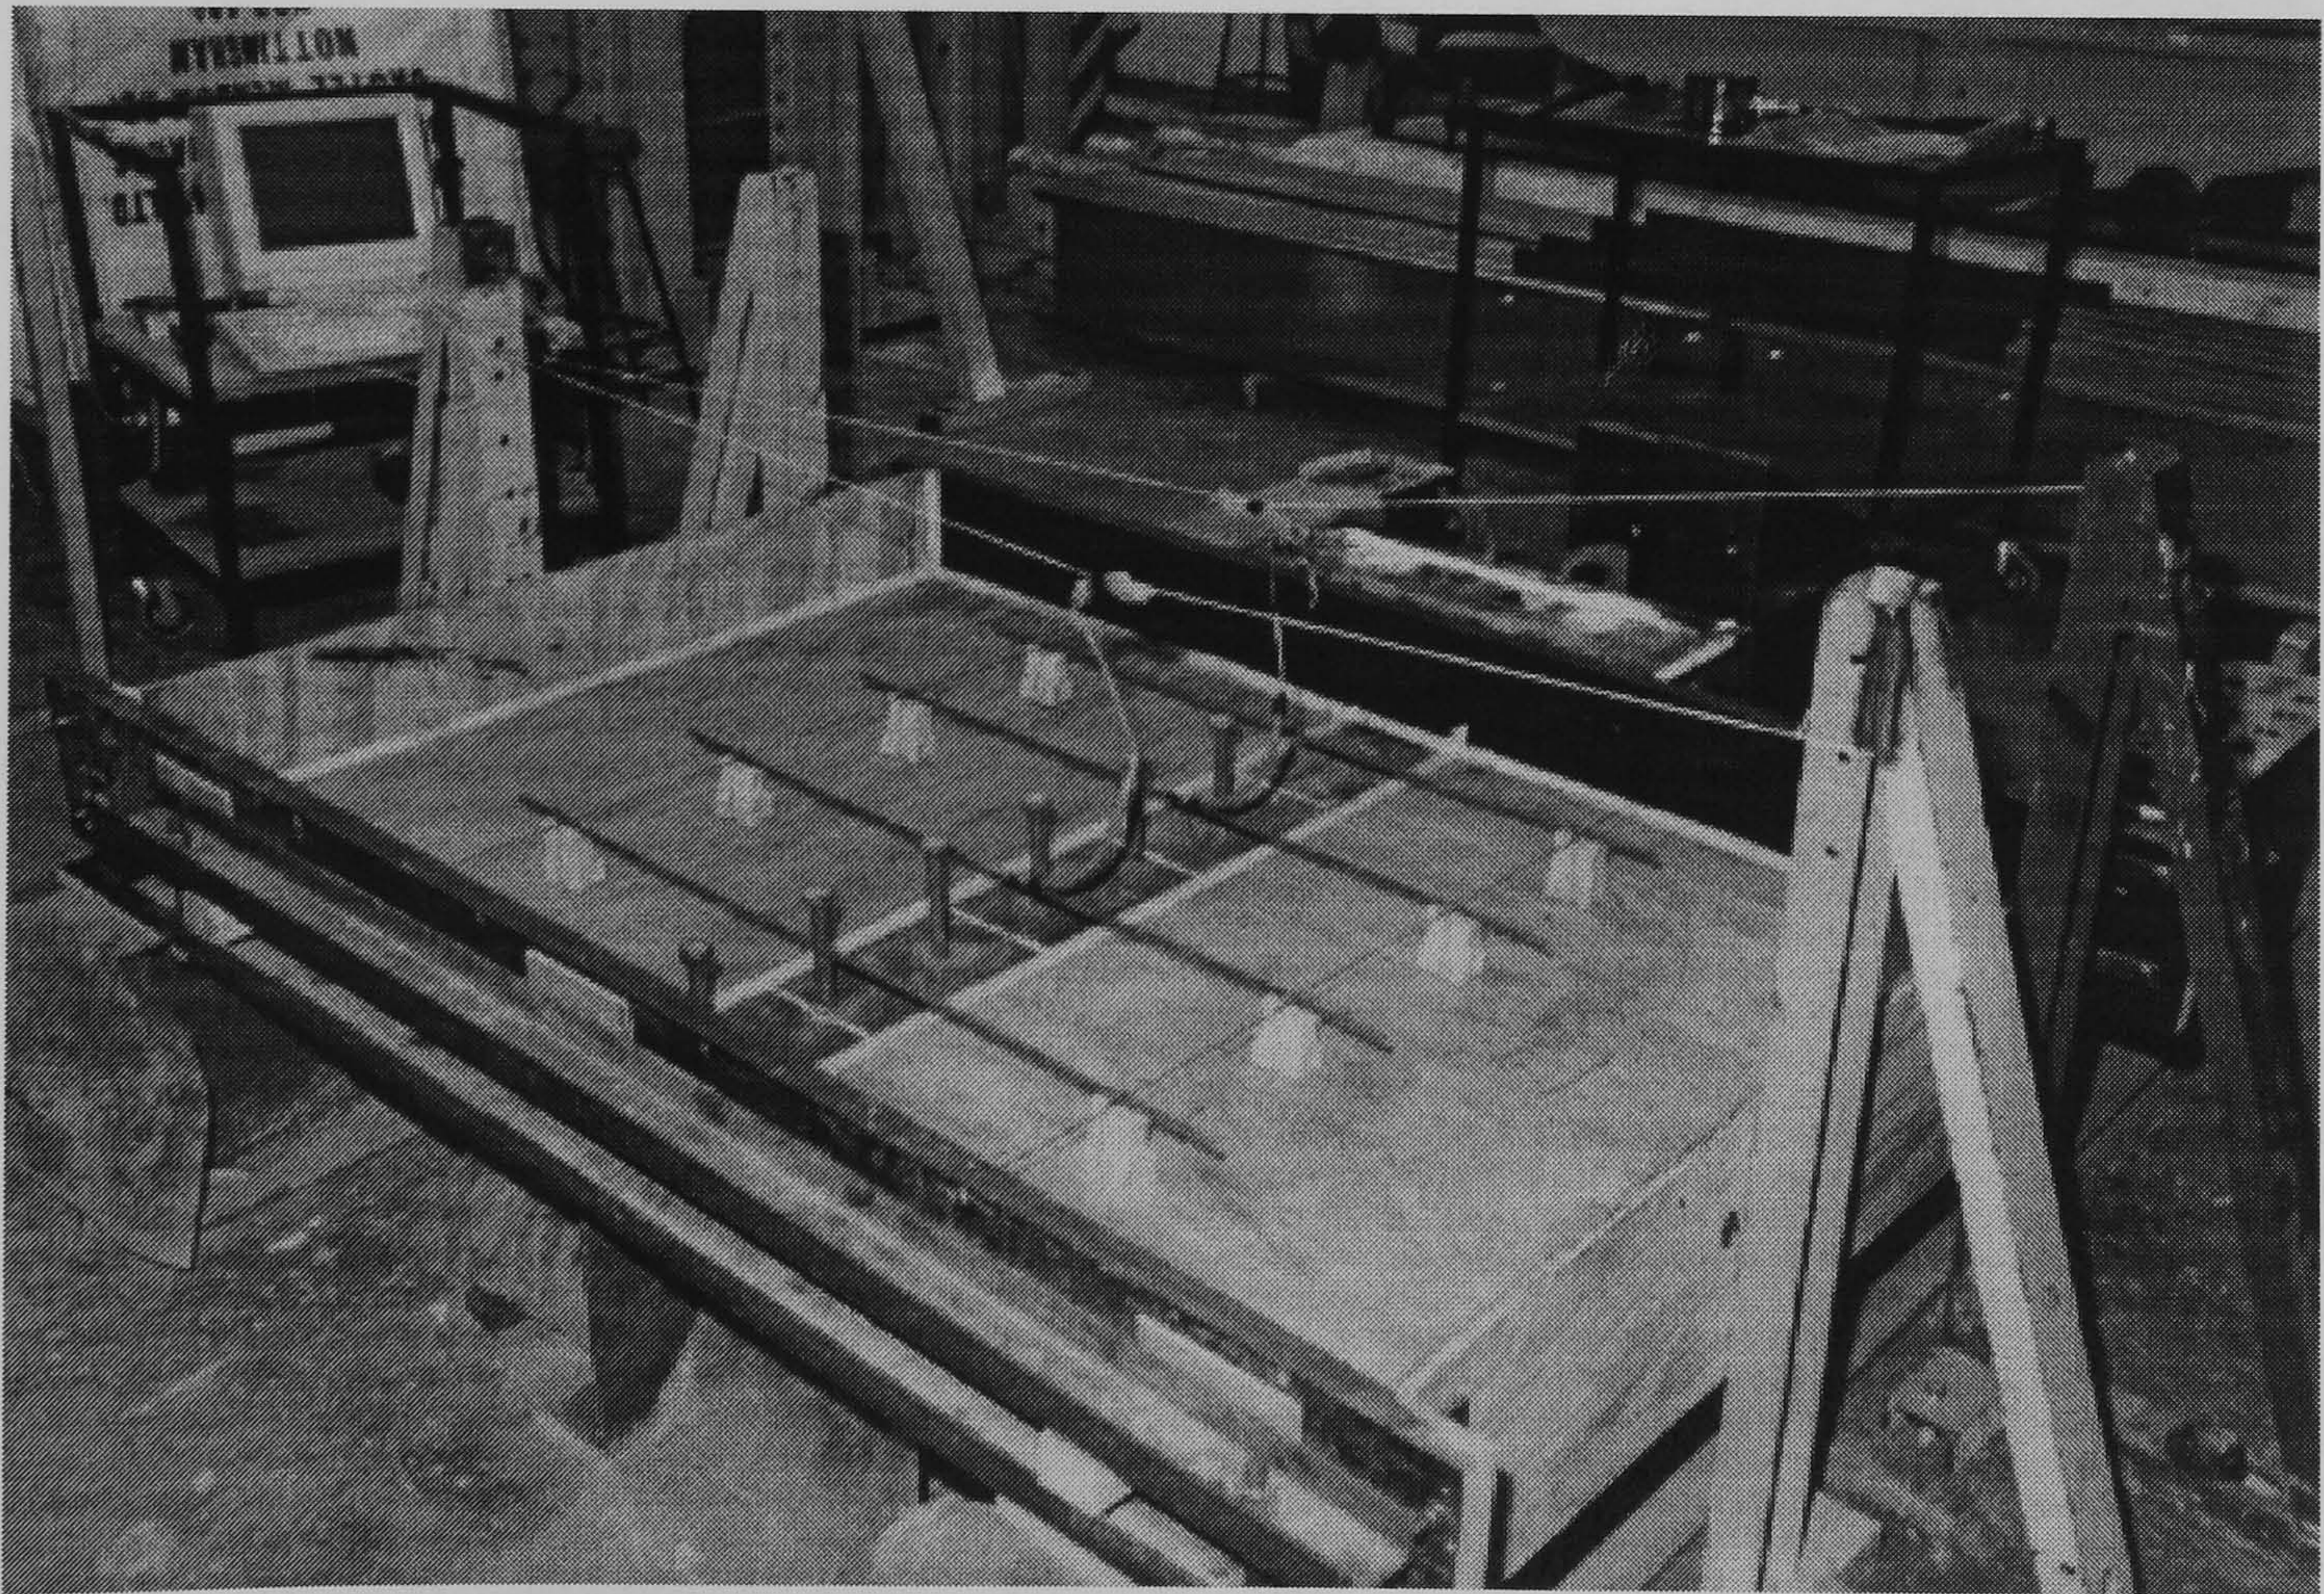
General arrangement of solid r.c. slab before concrete is poured
